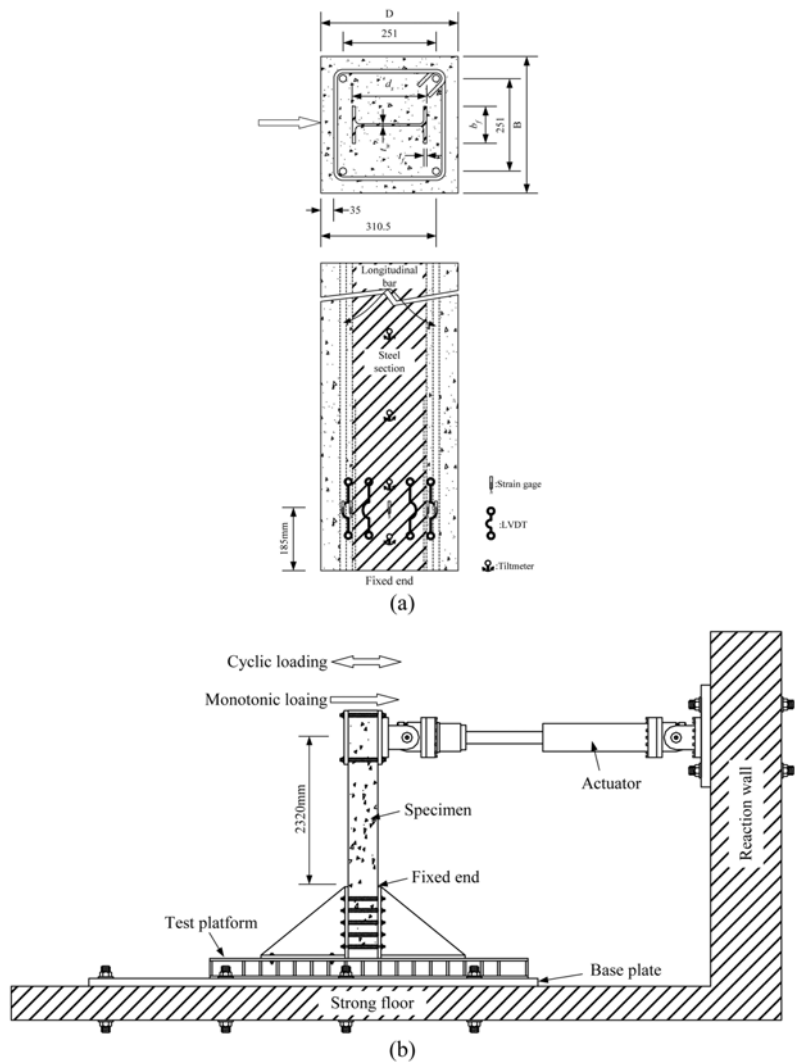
Experimental details: (a) cross-section and measurement arrangements for specimen; (b) test set-ups
